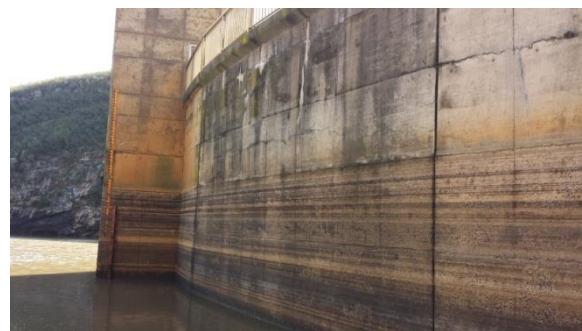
Hartebeeskuil Dam: The upstream concrete face viewed towards the inlet tower
